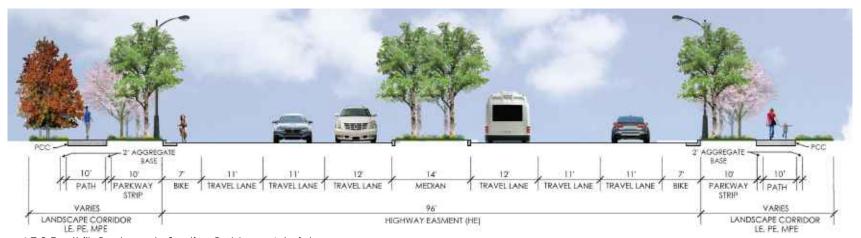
Foothills Boulevard - Section B, 6-Lane Arterial
